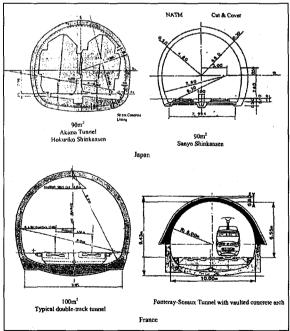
Typical Sections for Double-Track High Speed Rail Tunnels in Japan and France
